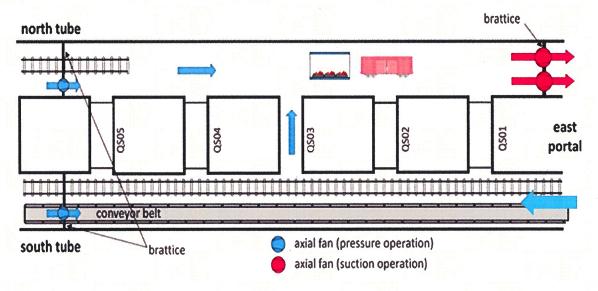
Sketch of the test section in KAT 1 of the Koralm tunnel (source: ÖBB)
